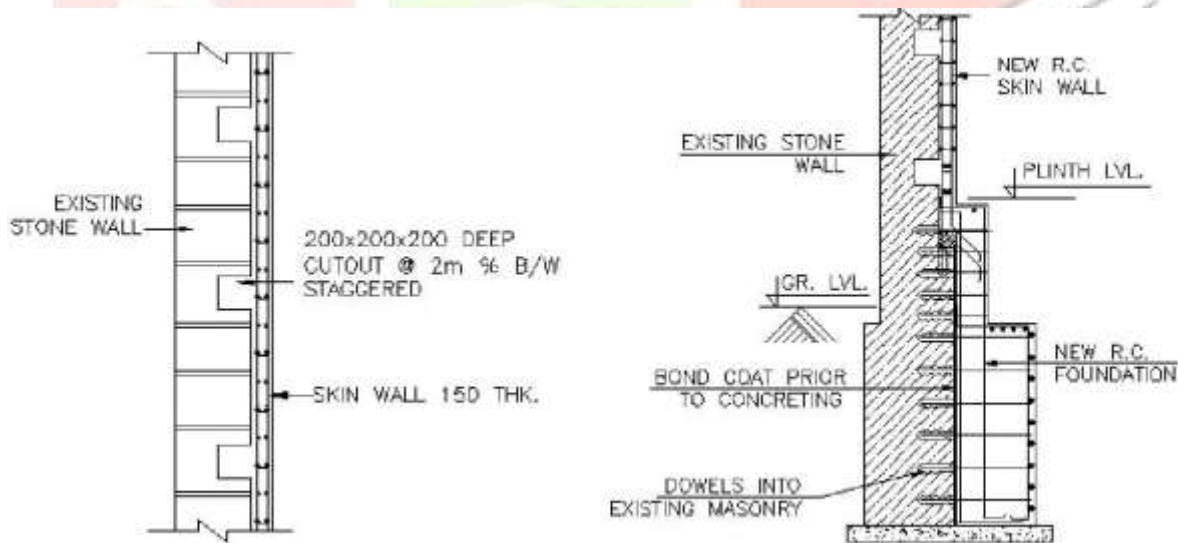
Details of New R.C. Skin Wall (a) R.C. Skin Wall Nogged in to Masonry Wall, and (b) New R.C. Skin Wall Foundation
